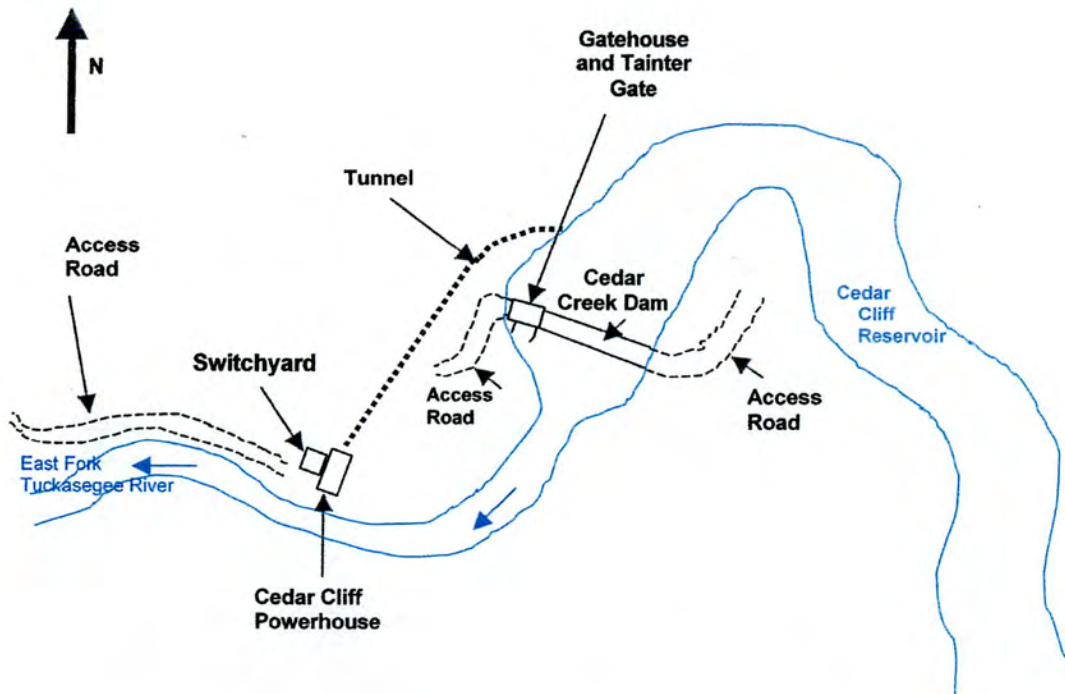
Cedar Cliff Dam and Powerhouse Site Plan.
